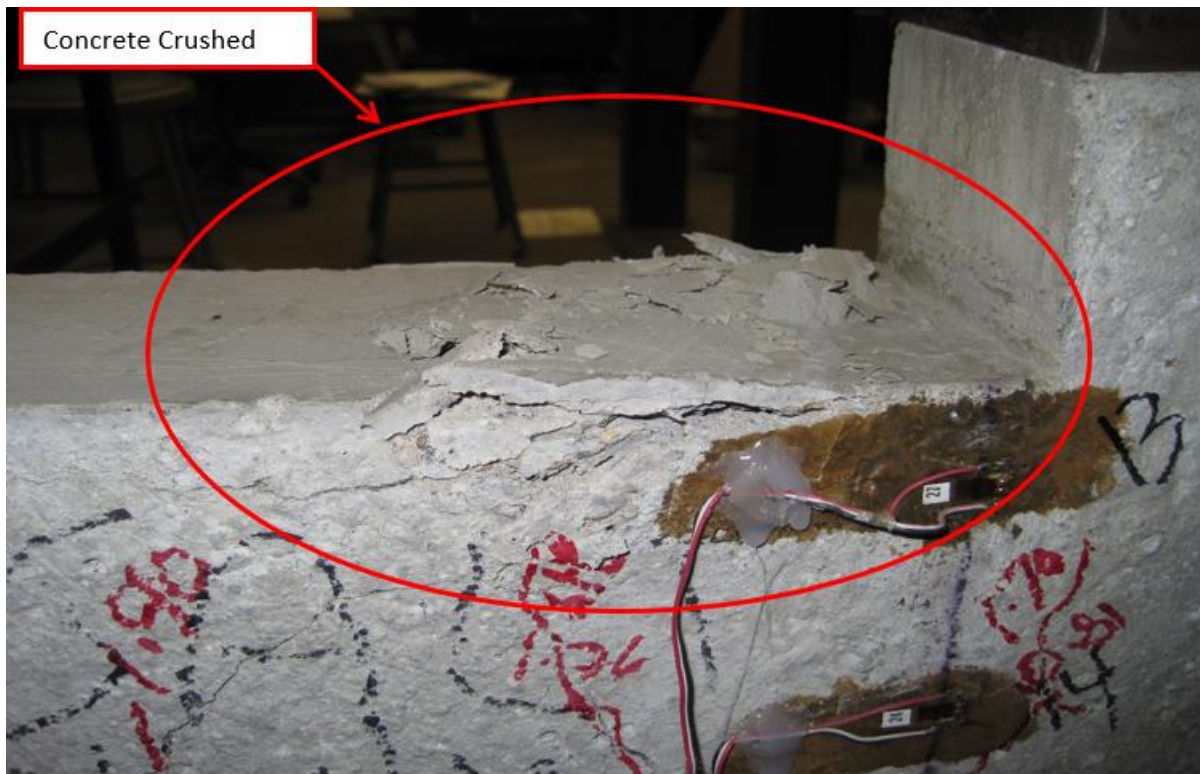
Right Support Concrete Crushed at Collapsed Load for Specimen B2-1
